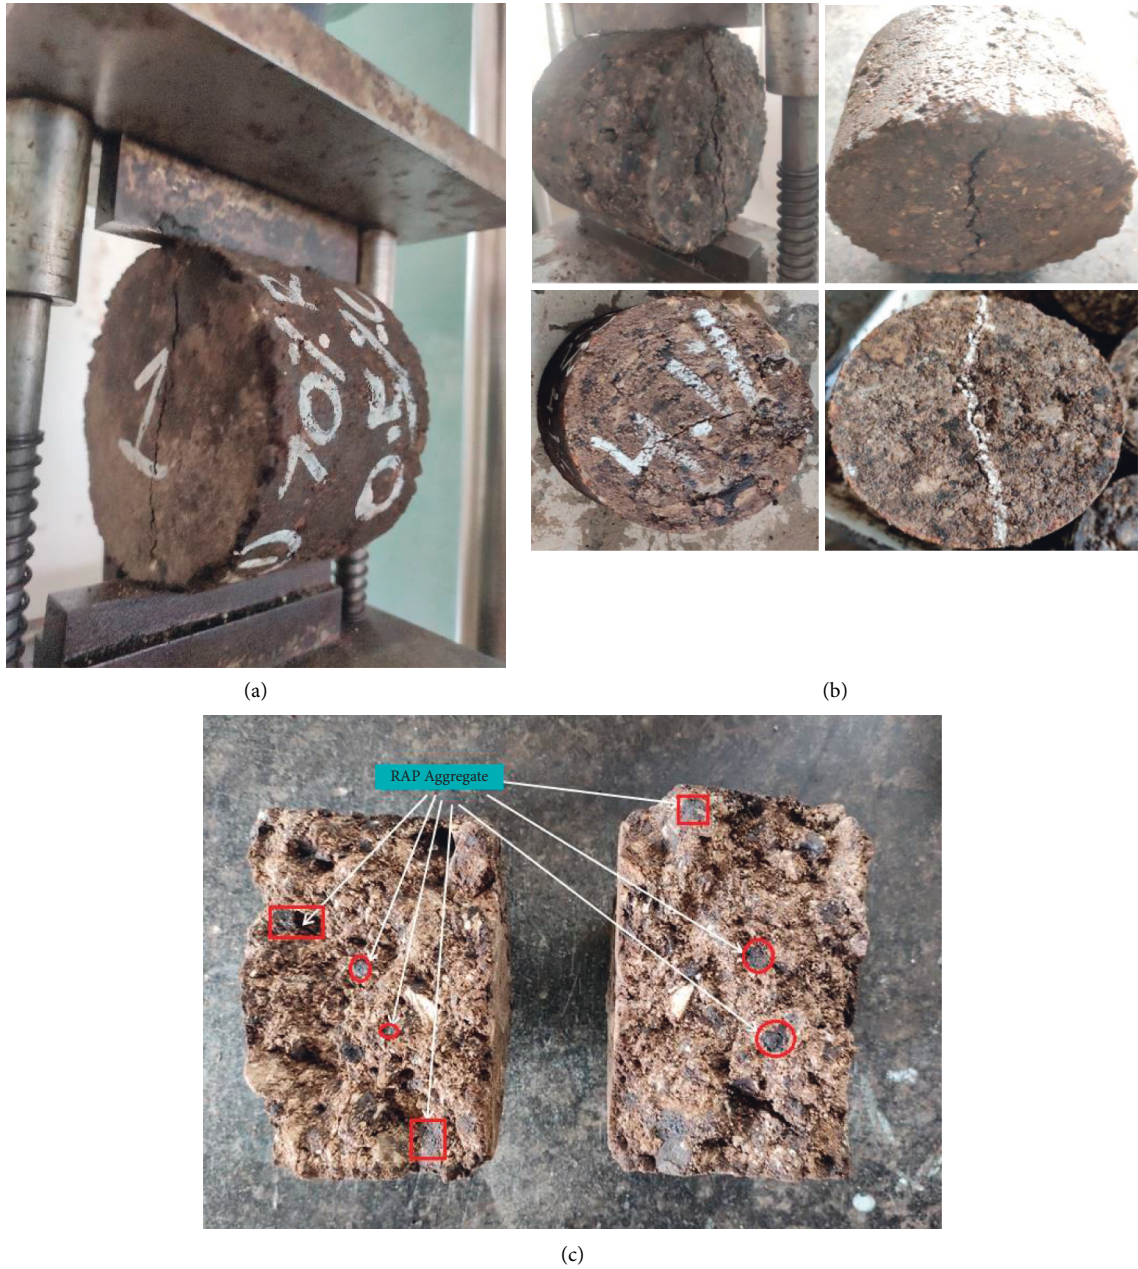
(a) ITS testing machine. (b) Sample after testing. (c) Sample after breaking.
